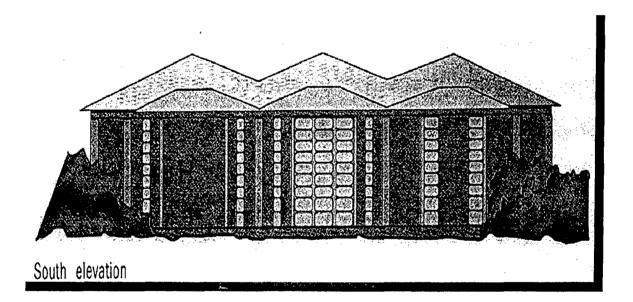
THE BUILDING OPENS UP TO THE SOUTH FOR WINTER
